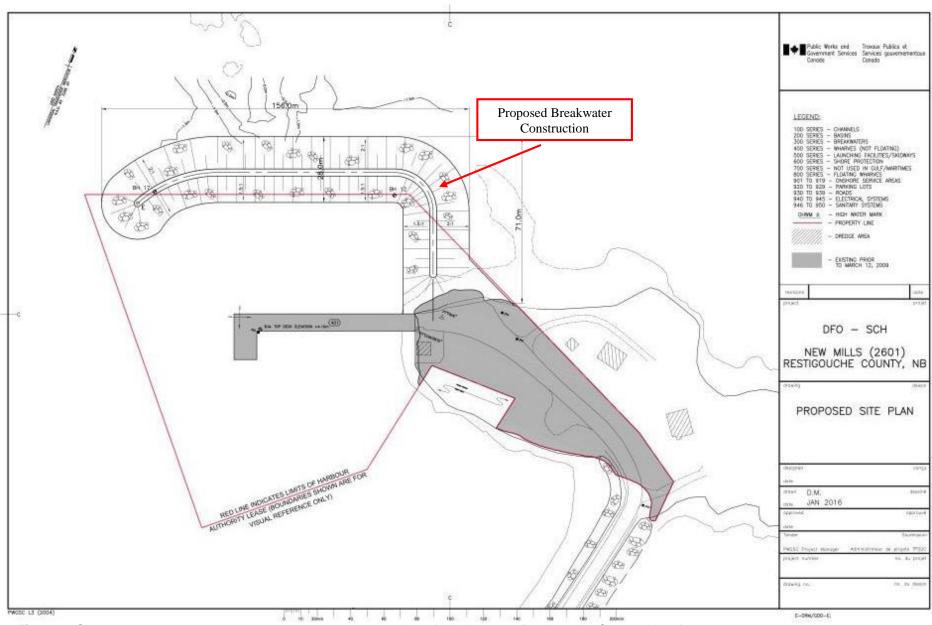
Site plan showing proposed breakwater construction at New Mills Harbour, Restigouche County, New Brunswick
